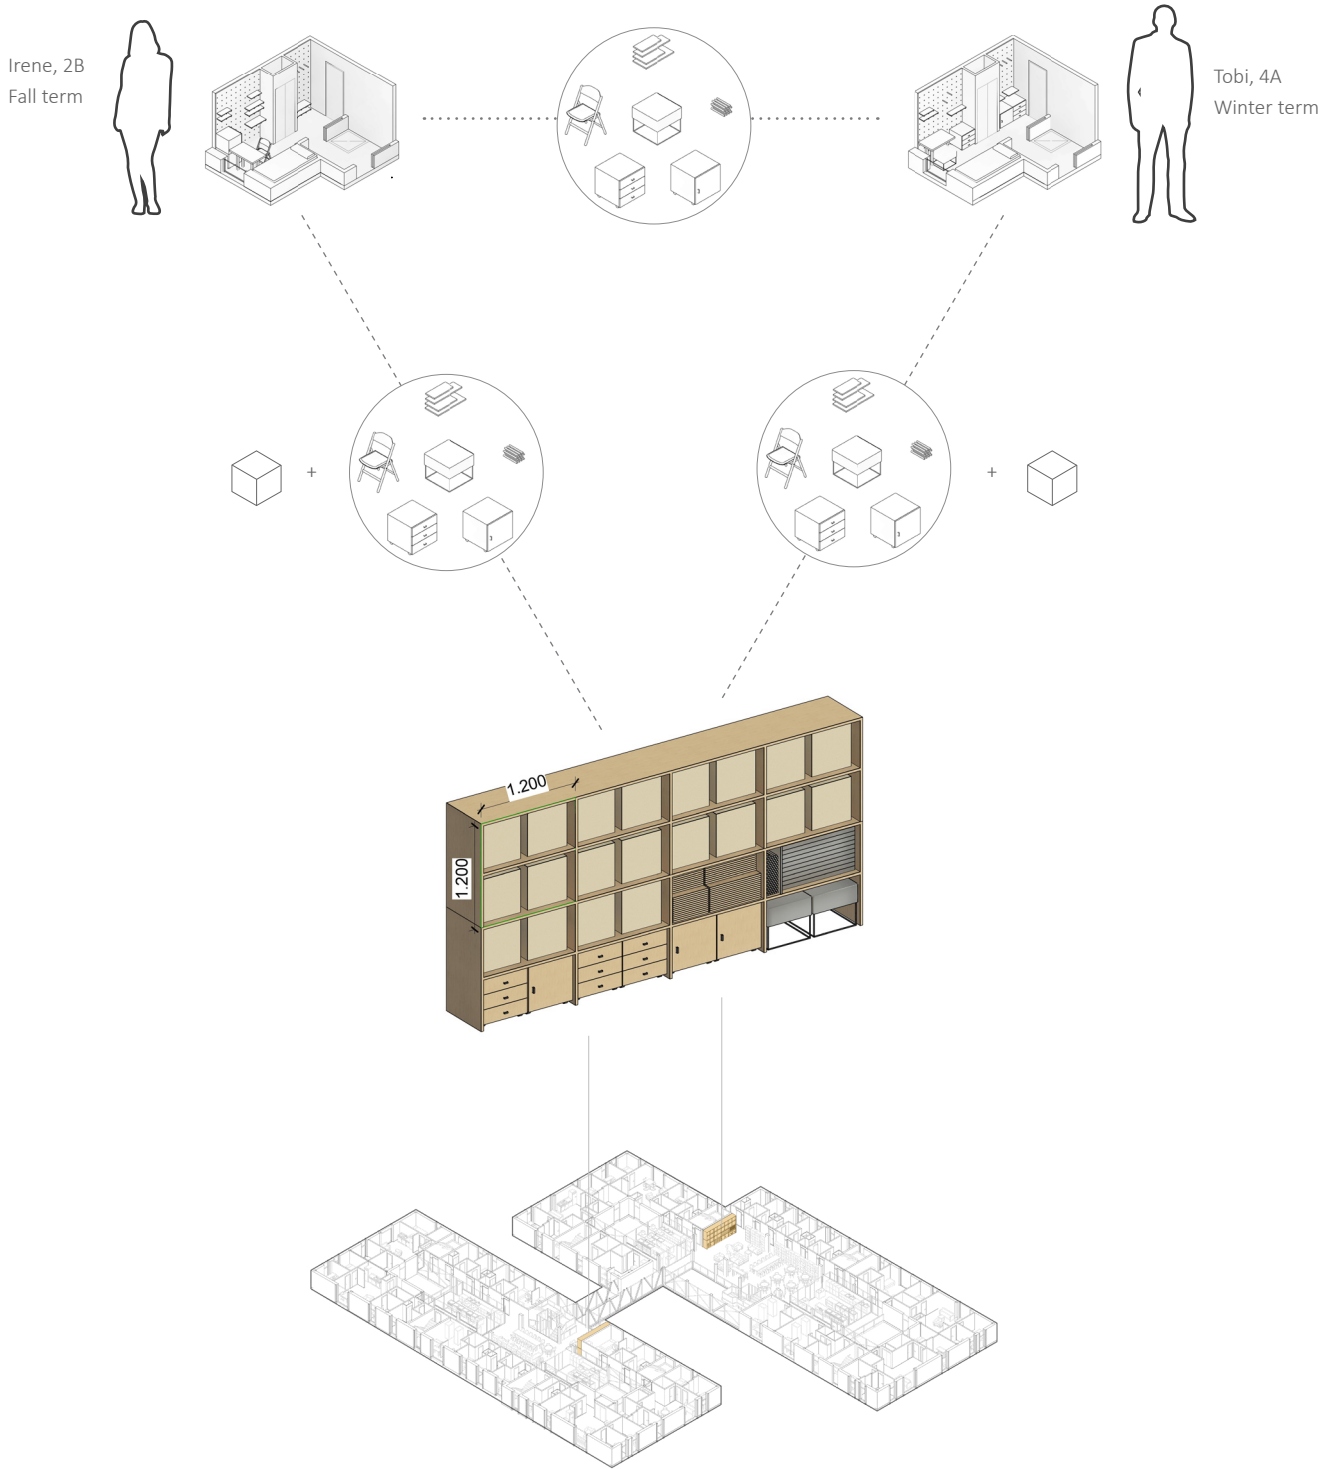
Students can exchange desired furniture either with the previous tenant or look for the desired item from the storage walls located in the central area of each floor. Lower sections are dedicated for furniture storage while upper shelves store personal belongings of students on co-op work terms.
